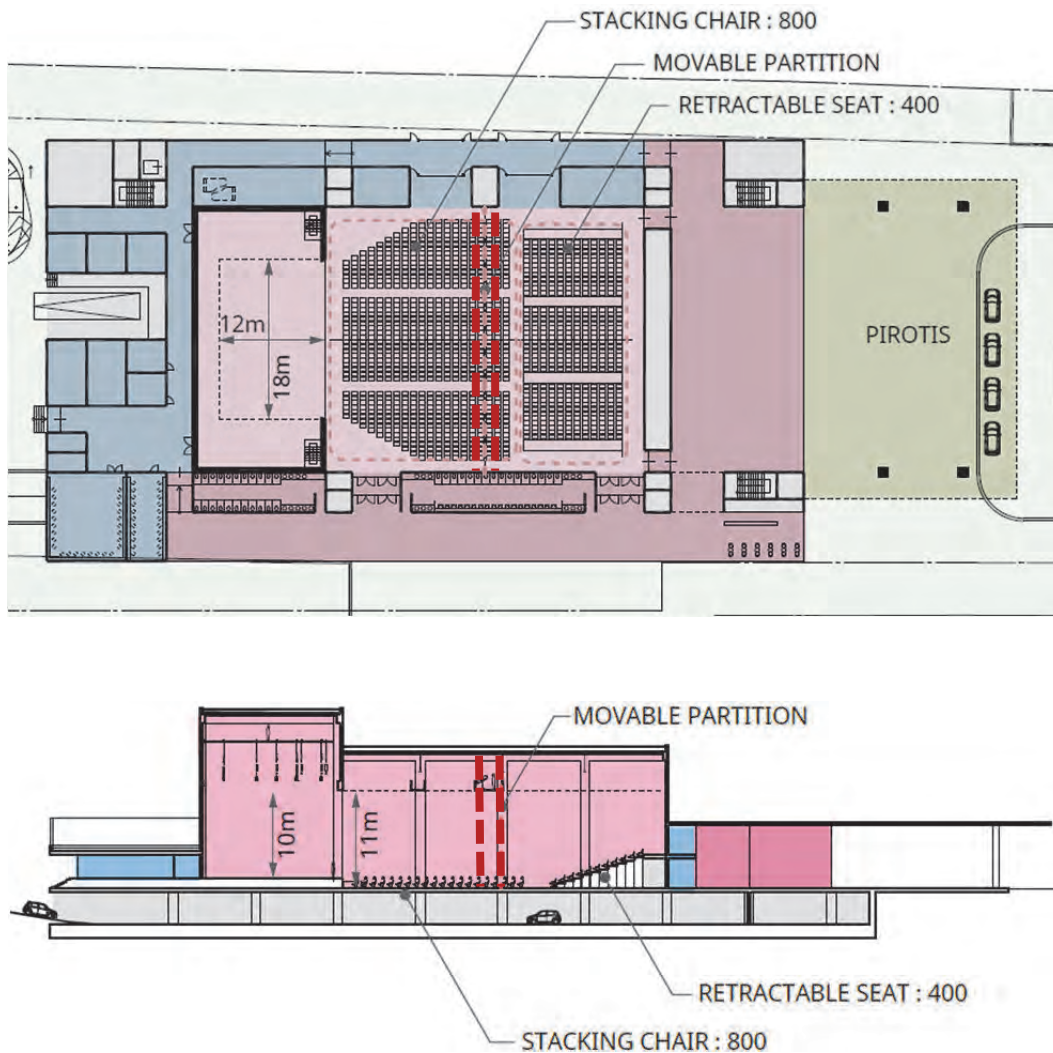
Floor Plan and Section of Main Hall (Alternative X)
